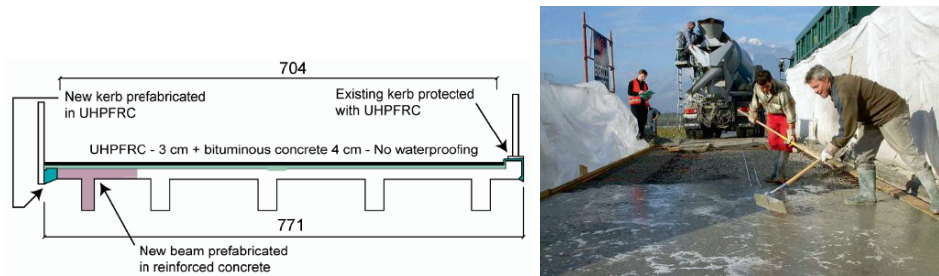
Bridge cross section after rehabilitation (dimensions in cm) and UHPFRC casting.
